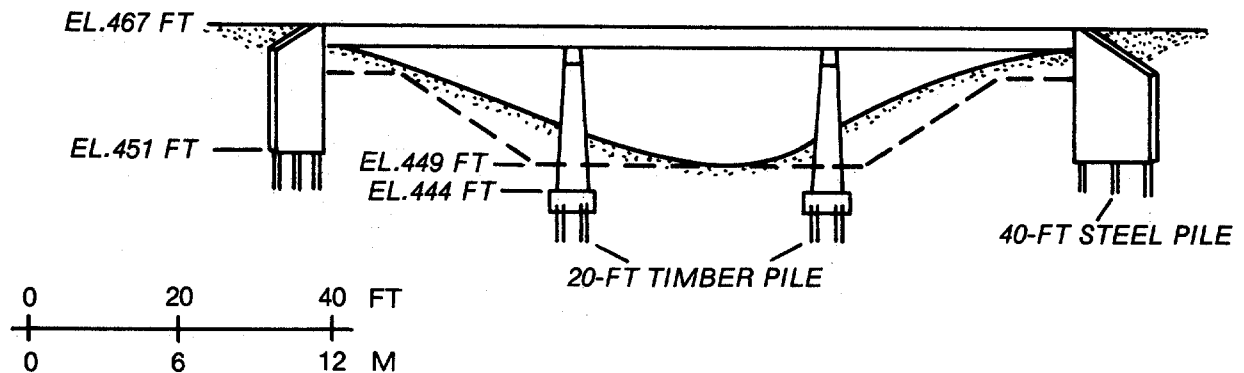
Elevation sketch of US-77 bridge at Rock Creek.
